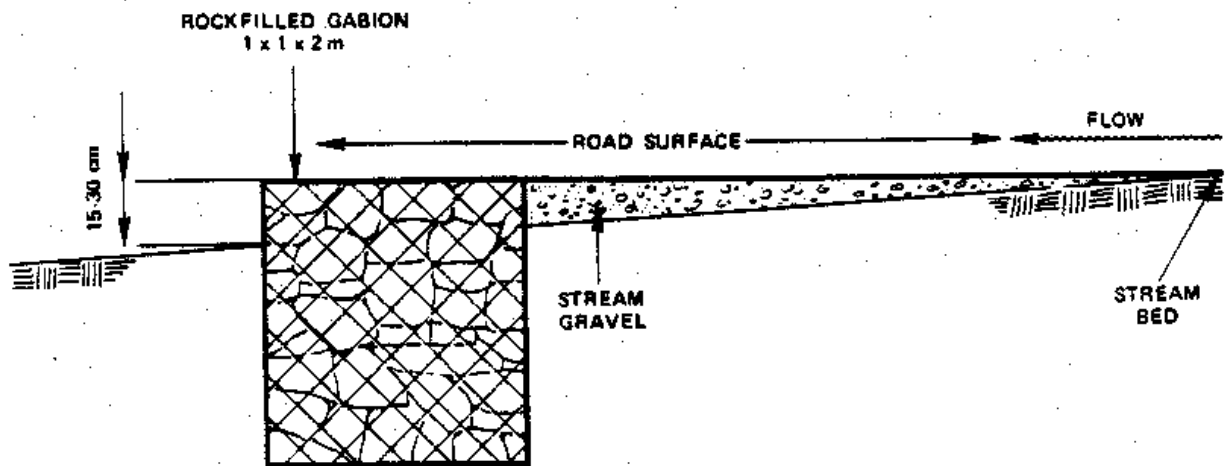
Ford construction stabilized by gabions placed on the downstream end. (Megahan, 1977)
